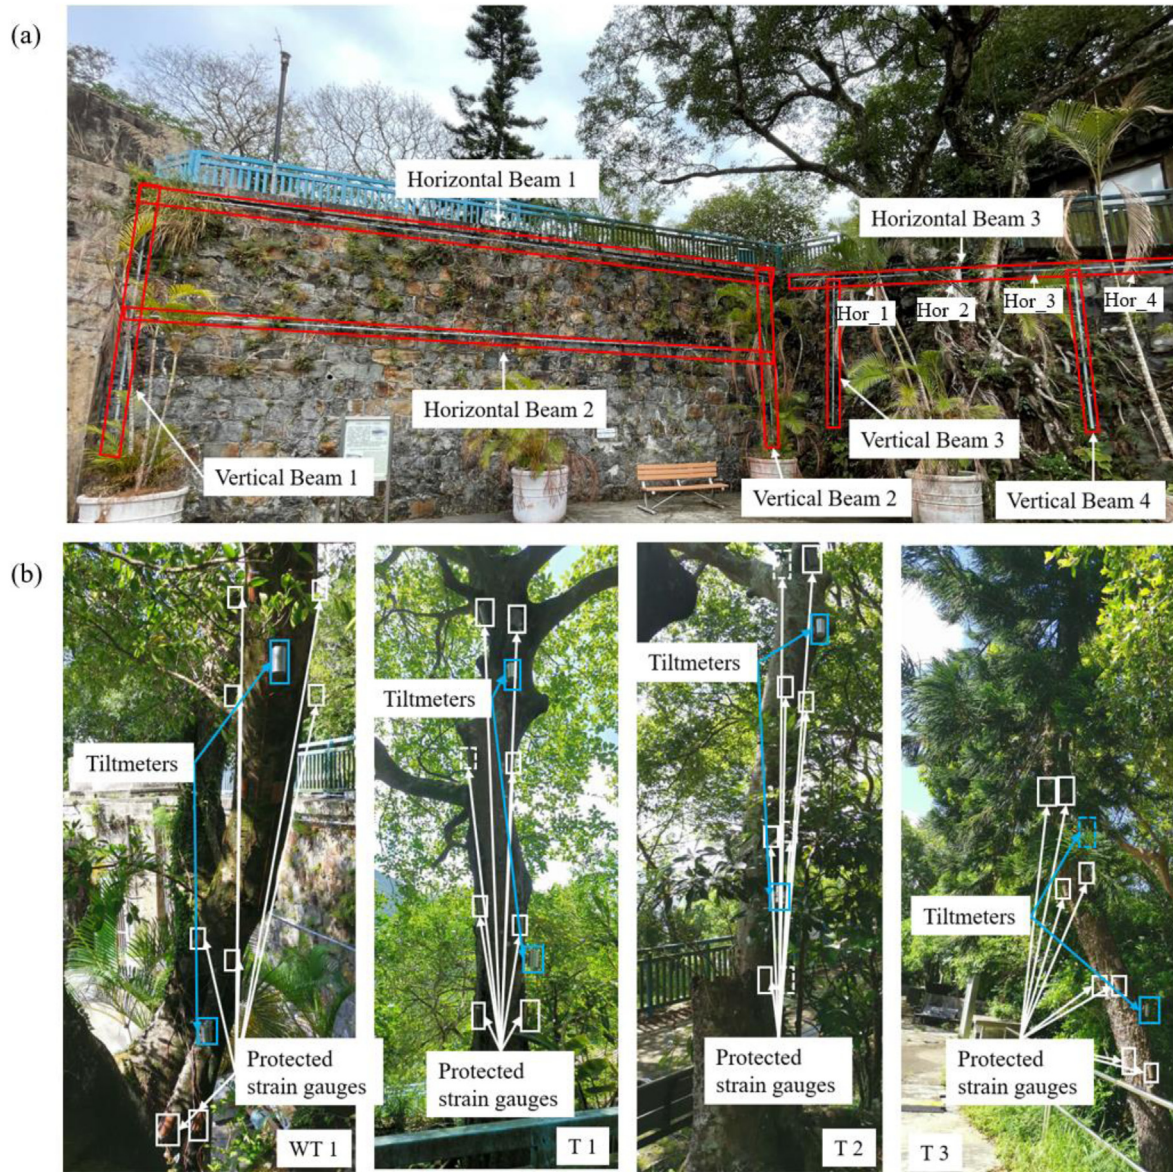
(a) The layout of measuring beams on the monitored masonry retaining wall (Hor_1 to Hor_4 represent the data of different horizontal beam elements above the stonewall tree WT1) and (b) the layout of FBG-based strain gauges and tiltmeter on monitored trees.
